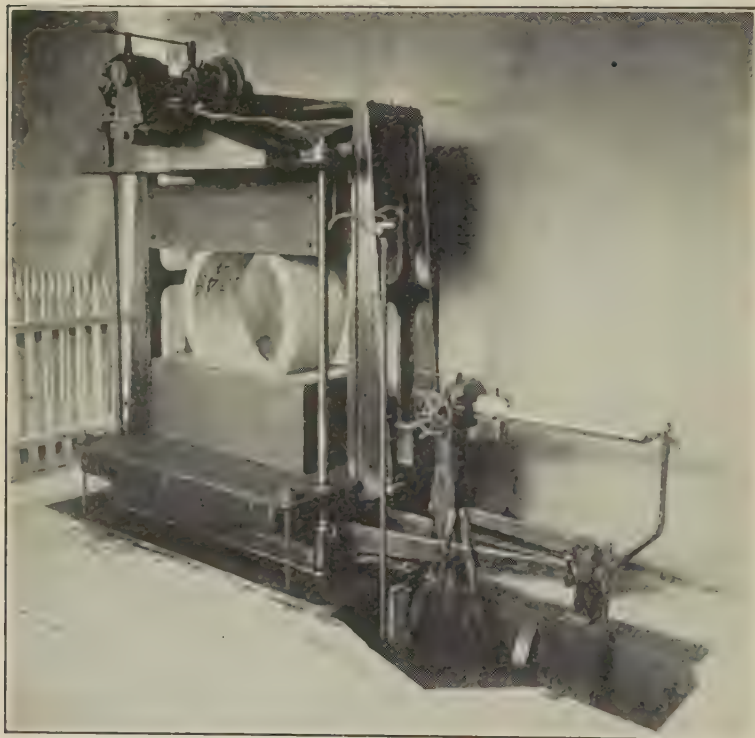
CULVERT PIPE IN TESTING MACHINE.
